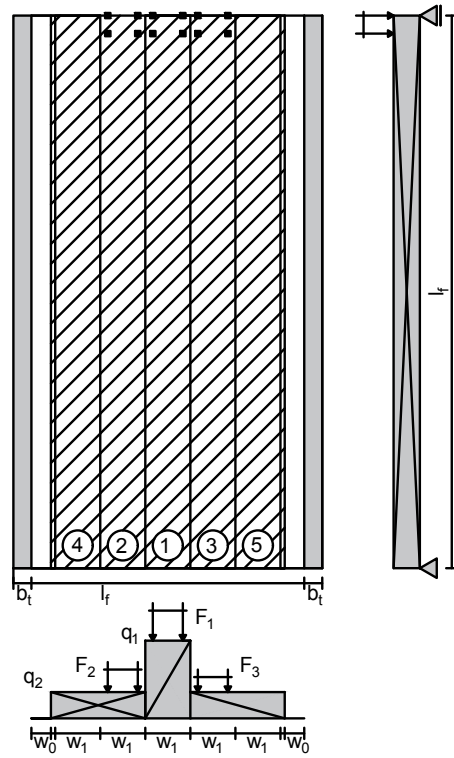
Load situation 2 - traffic load configuration for maximum loads in the floor girder at end span
